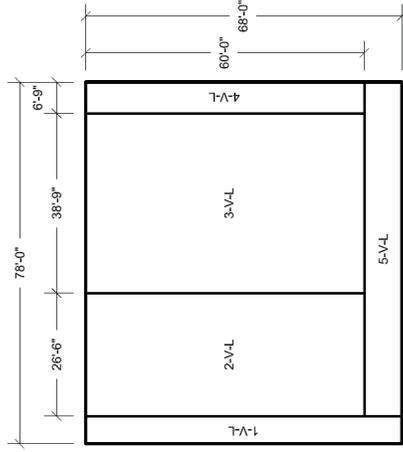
PUMP HOUSE EAST WALL LOOKING WEST
